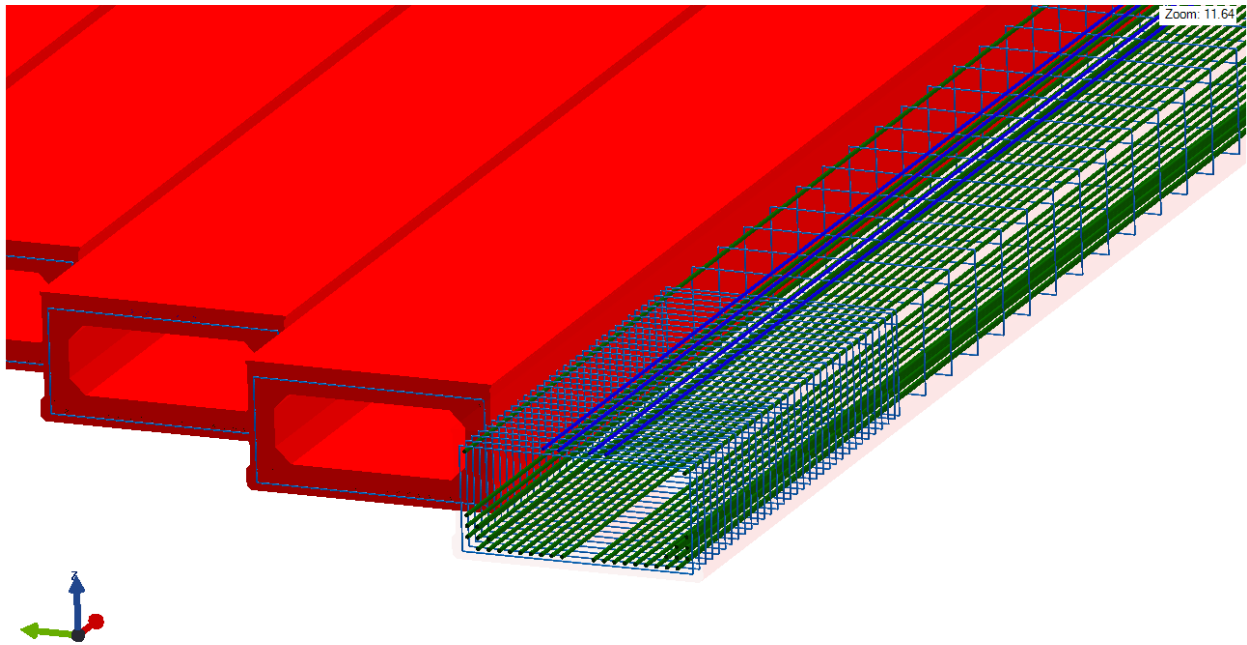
Zoomed-in view of Reinforcement (strands, longitudinal and transverse) in Box Beams
